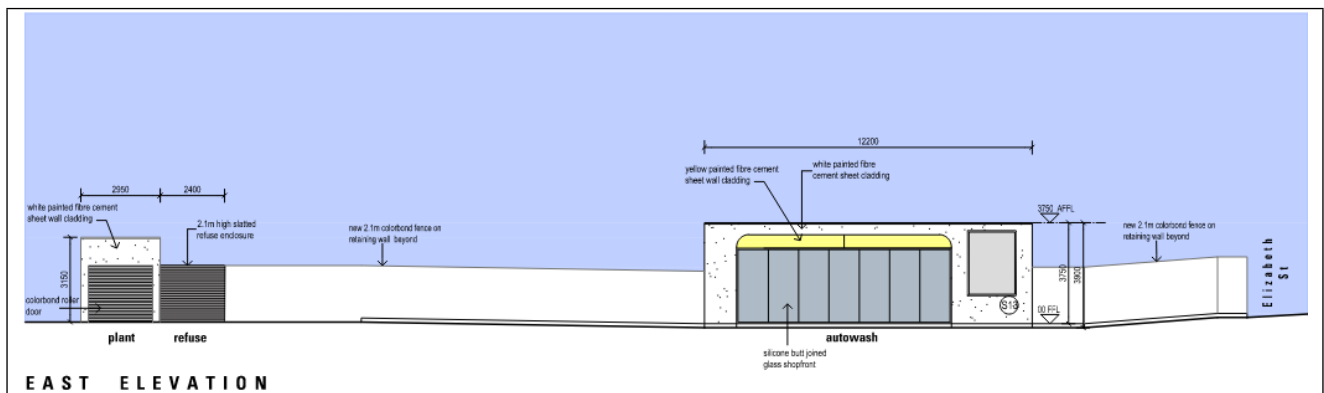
Eastern elevation of carwash and plant/waste storage (Source: Ratio)
